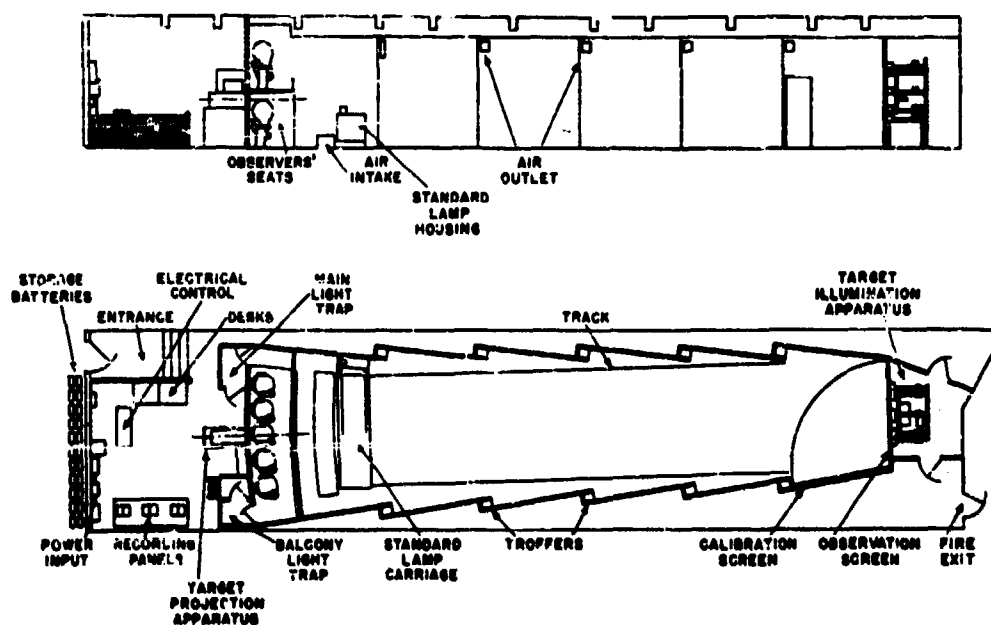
Top view elevation of observation room; bottom view plan of observation room.
